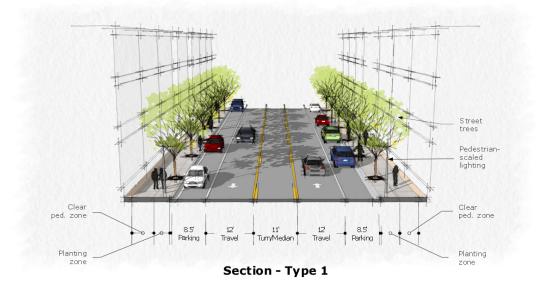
Configuration and dimensional requirements for street section "Type 1" areas identified in the Street Section Plan.
